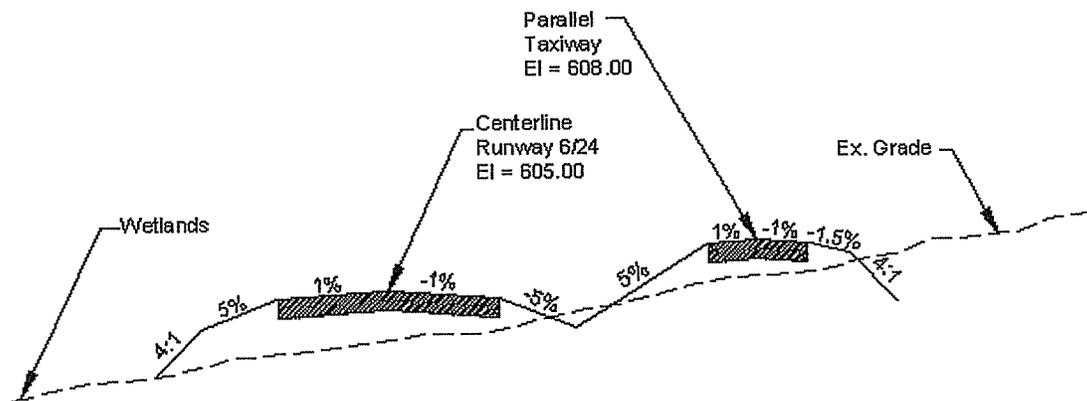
Runway 6/24 and Parallel Taxiway Typical Section
